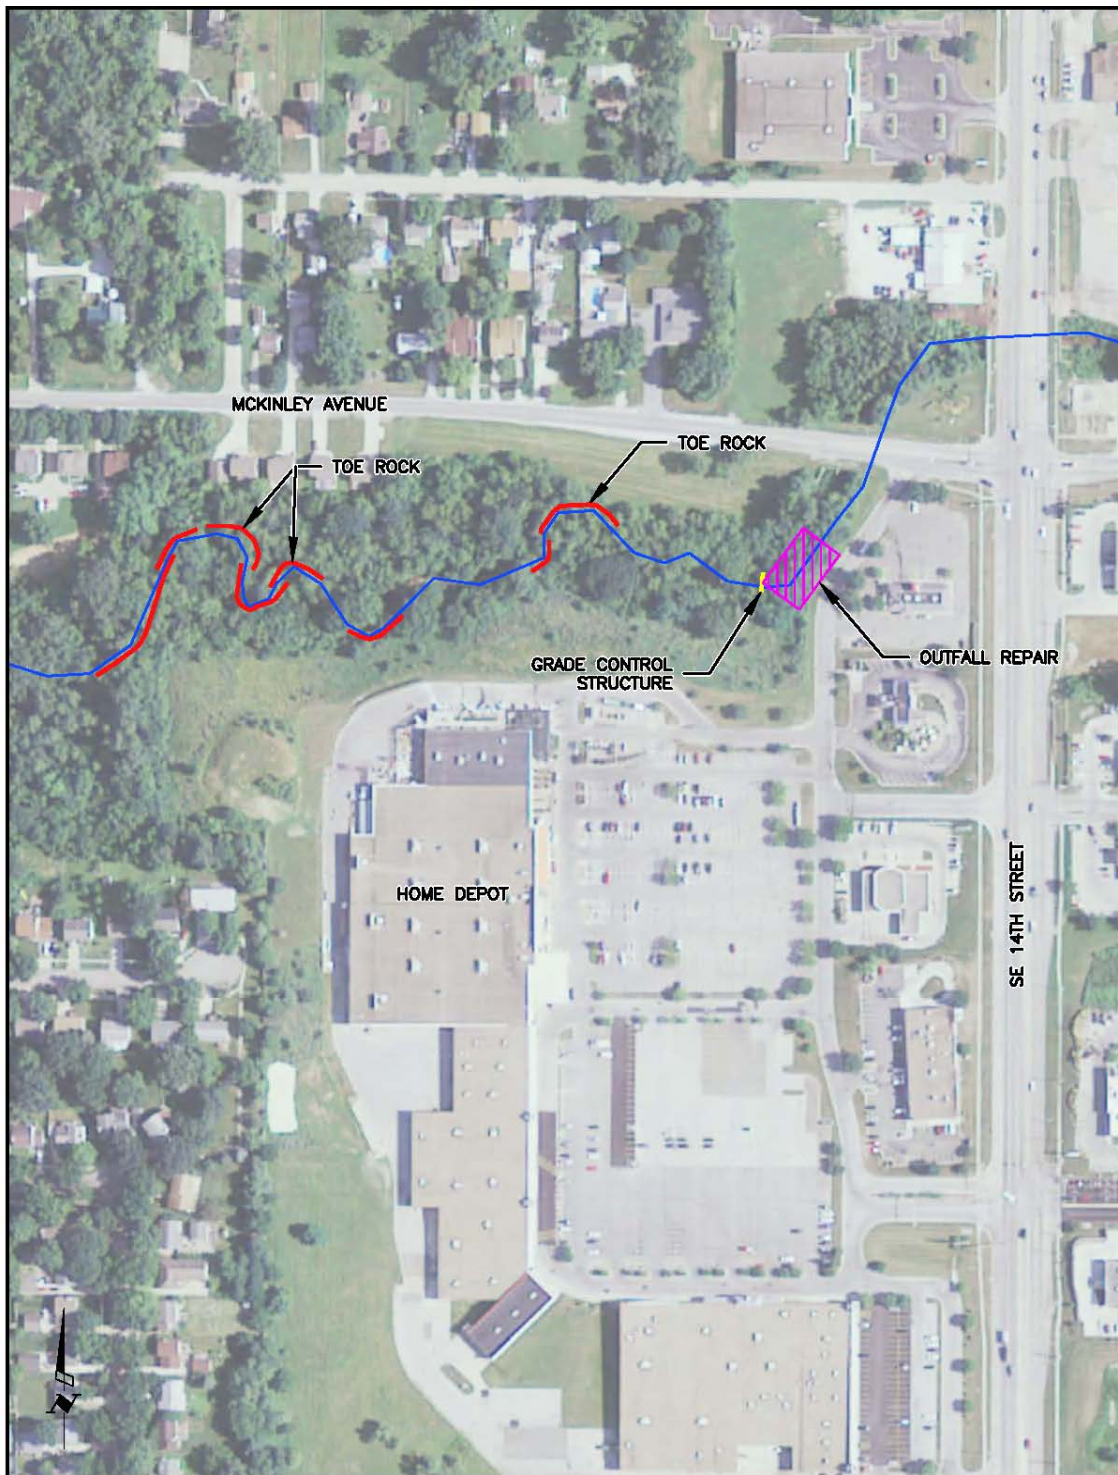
YC-10: Main Branch at East McKinley Avenue and Southeast 9th Street
